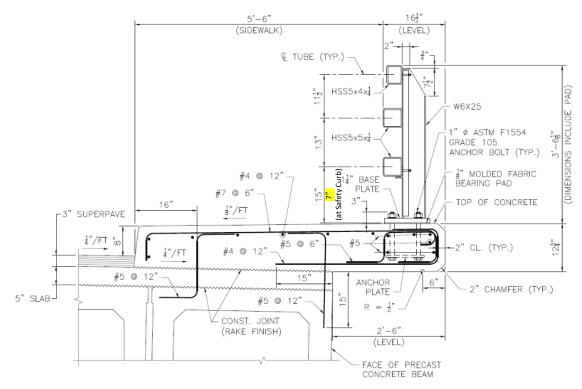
Profile drawing of the S3-TL4 bridge rail for sidewalk-mounted system.
